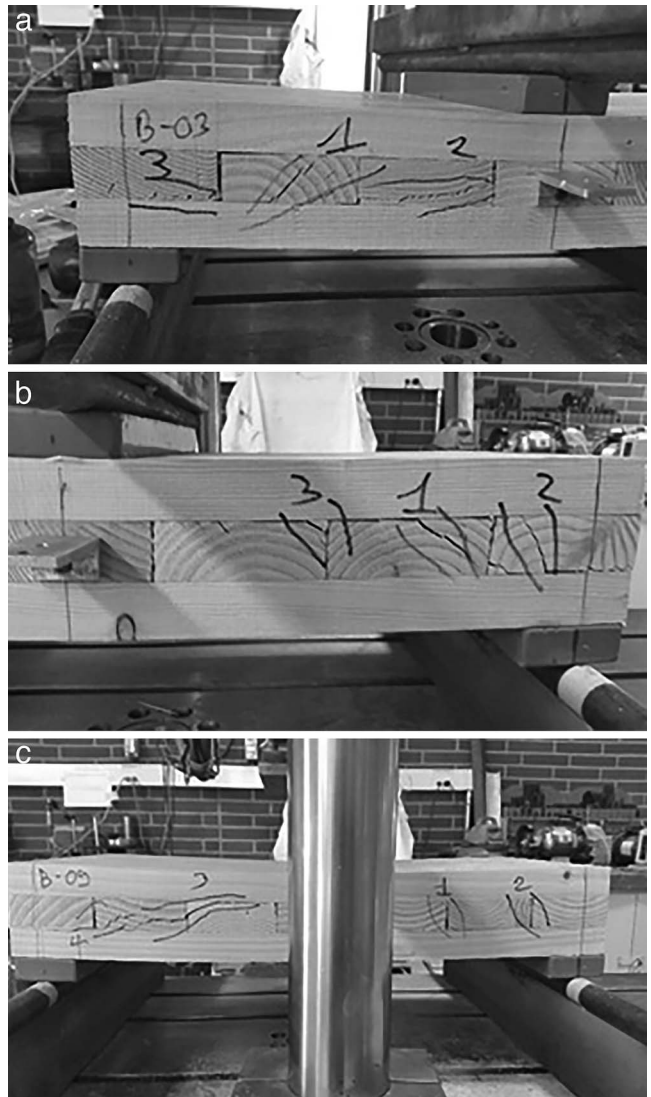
Typical rolling shear failure modes in the short beams with knotty cores.
